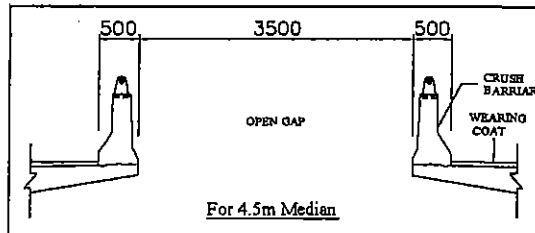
Typical Cross Section (TYPE - VIII B)
